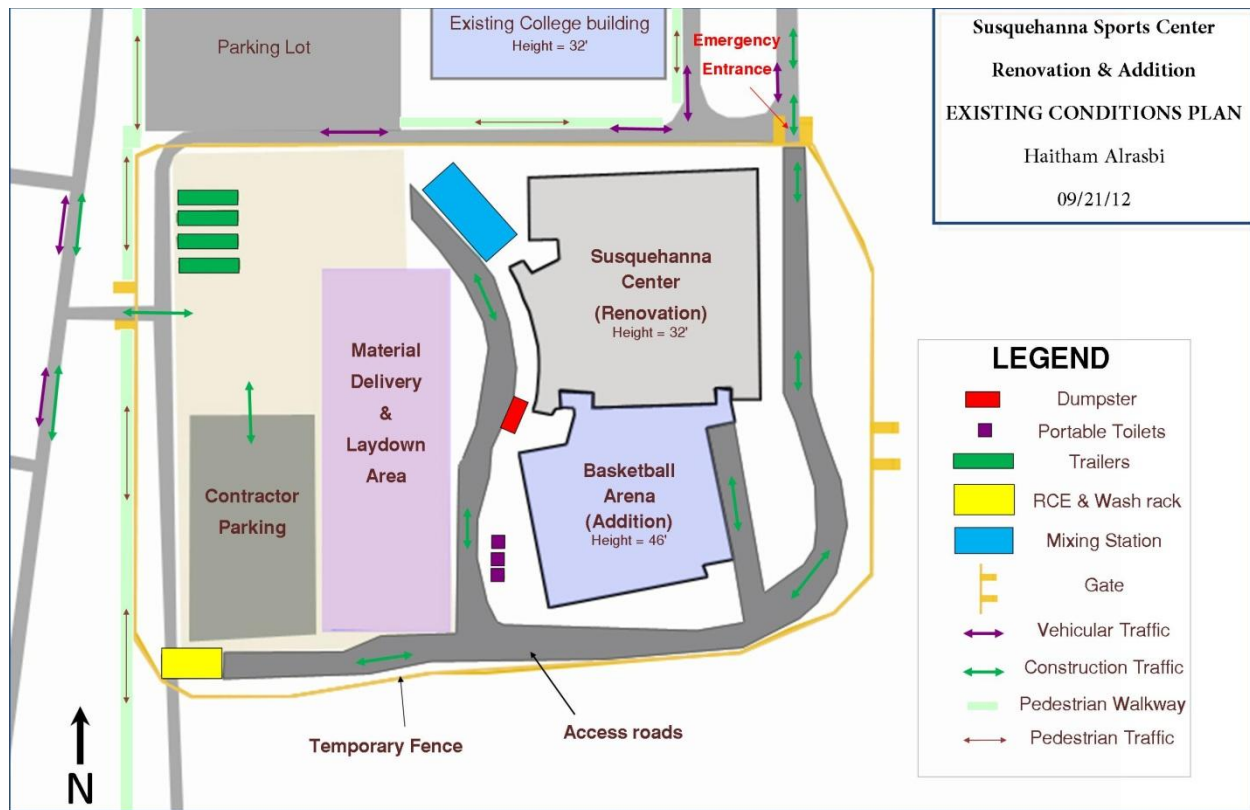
EXISTING CONDITIONS SITE PLAN
